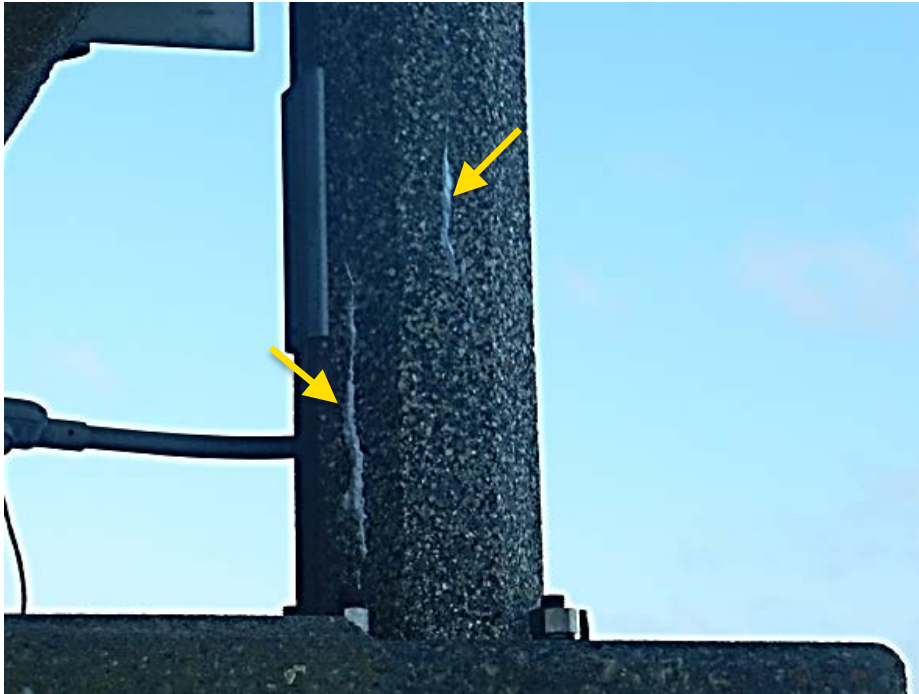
BNB129 Light Pole – Cracking at Baseplate with Efflorescence (Looking Southwest)
